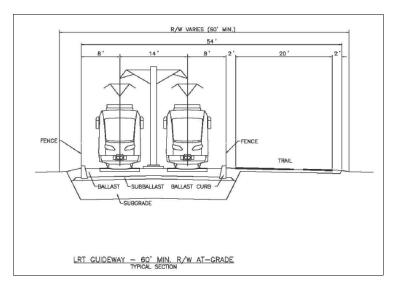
A section showing the guideway adjacent to a bike / walking trail (from the DEIS).
